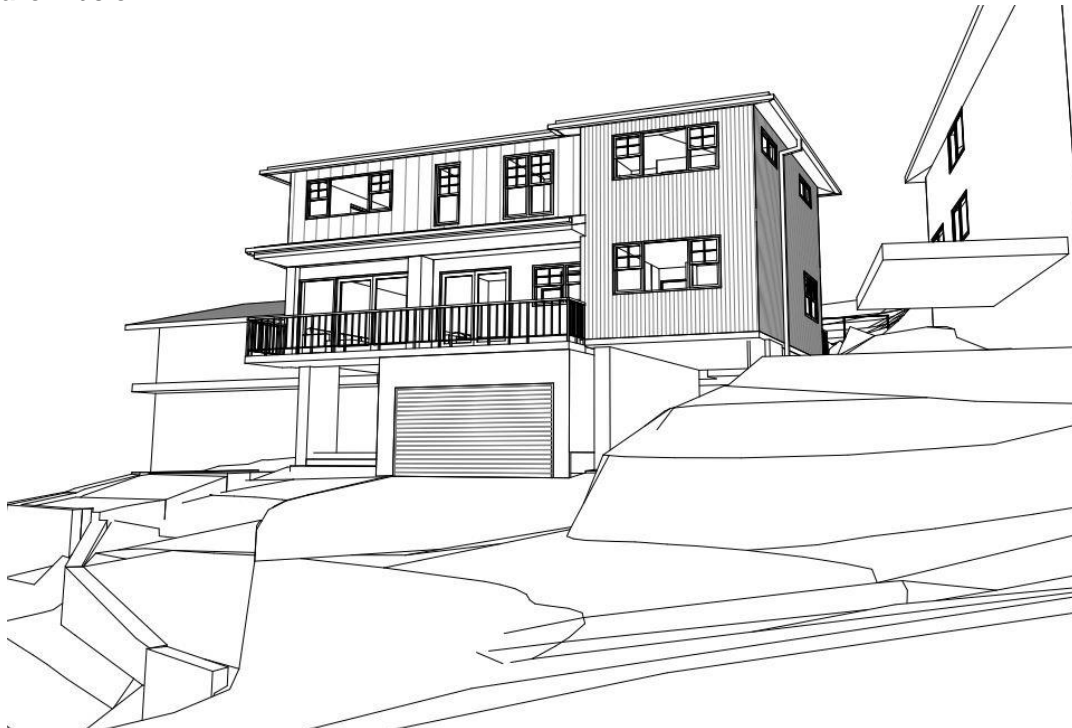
Proposed Perspective (Source: Zugai Strudwick Architects)
